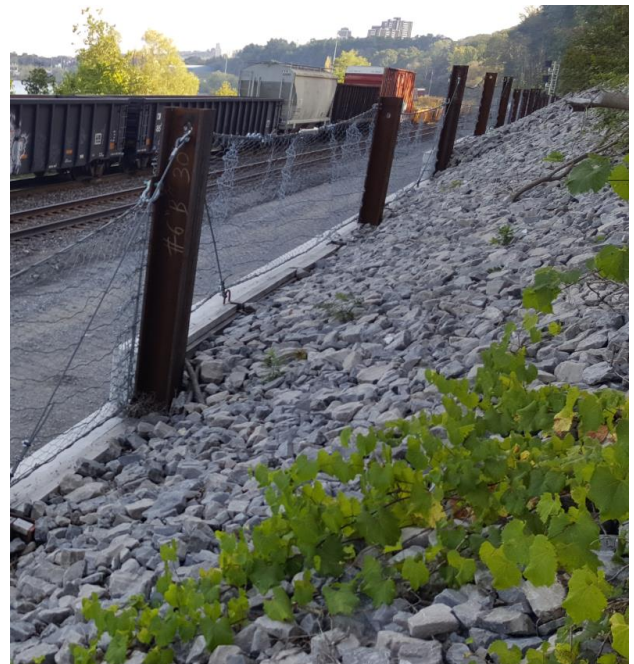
Completed Hybrid 'H' pile and concrete retaining wall view upslope of the barrier
